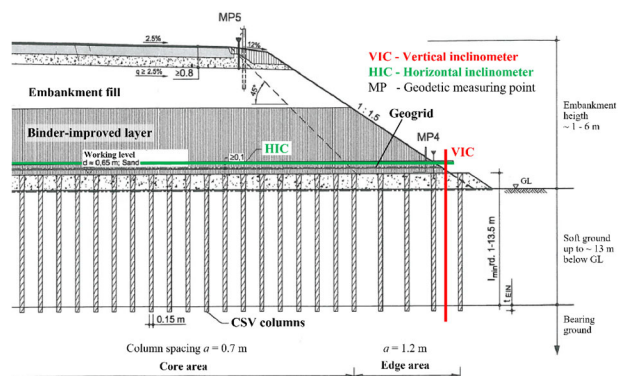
Principle cross-section of the BAB A 20 embankment structure showing the measuring equipment (after Rackwitz et al. 2021)
